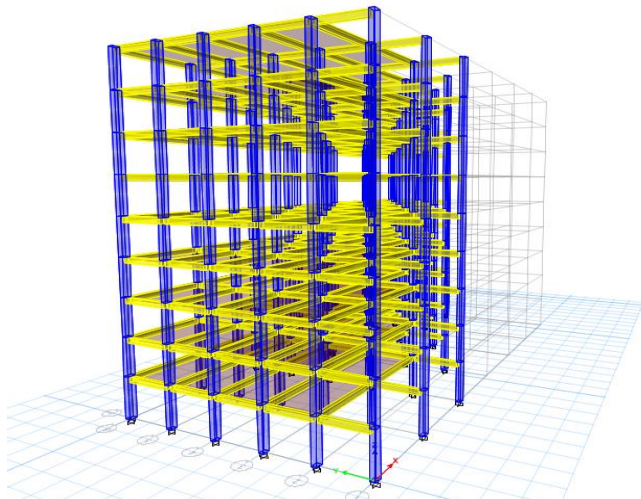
3D view of building model with 45 degrees inclination to horizontal plane.
